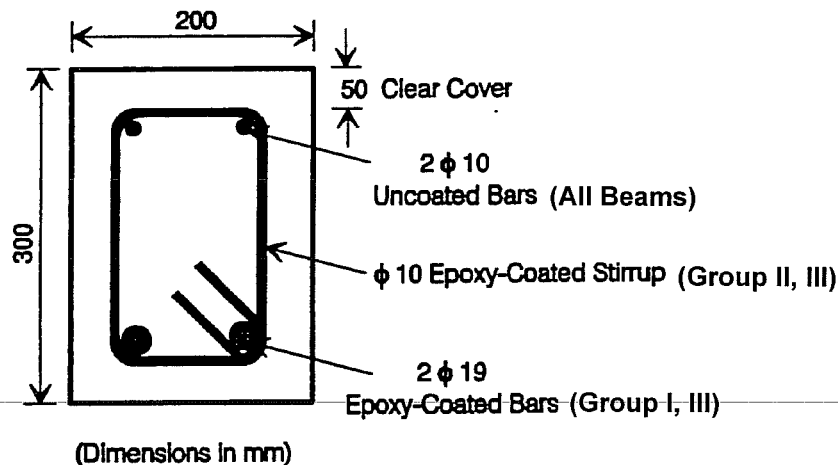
Cross Section of the Beams and Bars Exposed [Kahhaleh, 1994].
